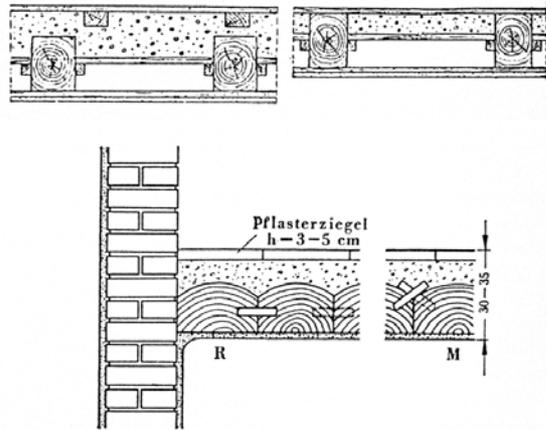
Composite timber-concrete floor systems. (Pauser)
